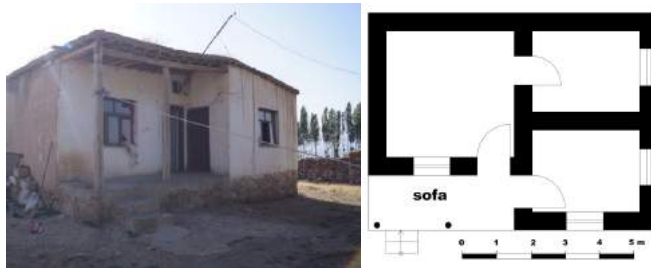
The outer sofa plan. Yalınağaç Village
